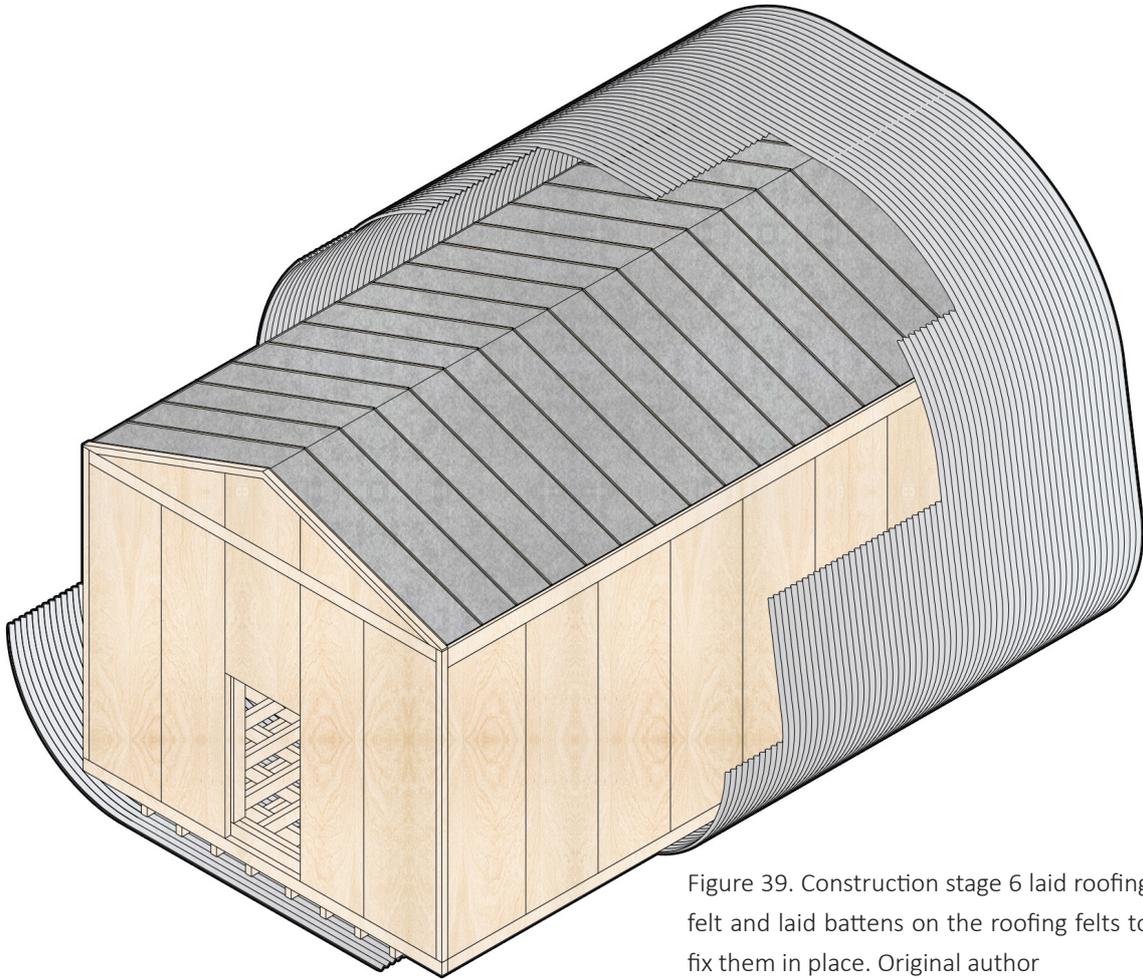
Construction stage 6 laid roofing felt and laid battens on the roofing felts to fix them in place. Original author
